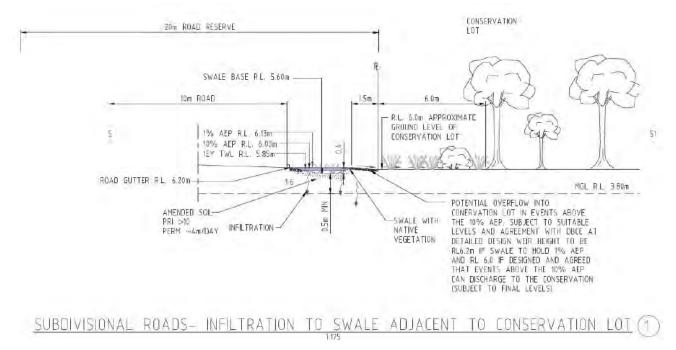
Cross section of road reserve showing swale and potential overflow to Conservation Lot
